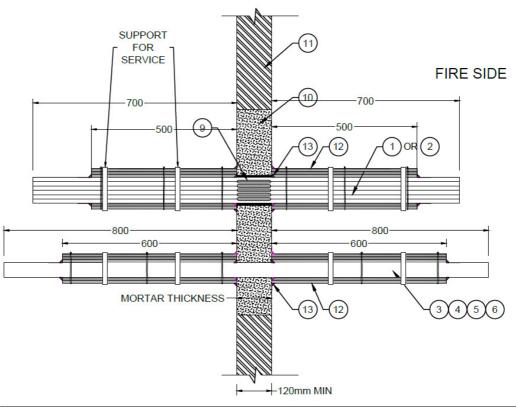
Typical Details for Cables and Metal Pipes wrapped with Emat in Walls
